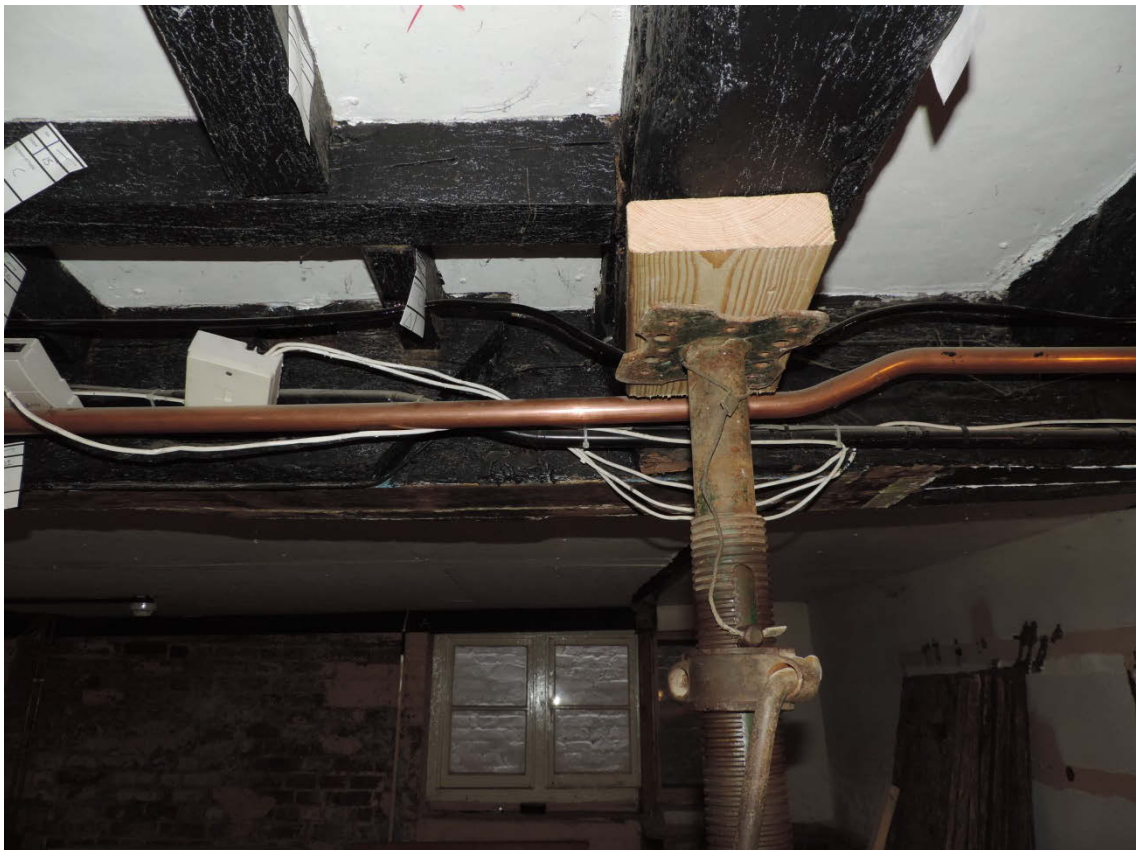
Reused wall plate timber beam [101] showing the half lap dovetail joint
